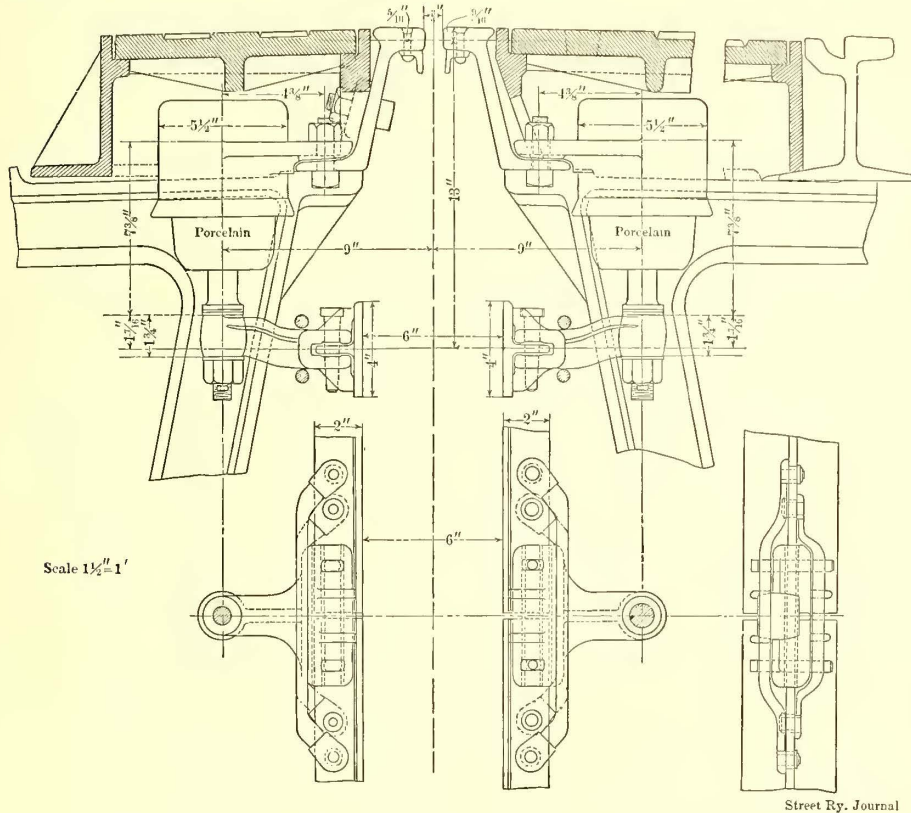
PLAN AND SIDE ELEVATIONS OF INSULATORS IN CONDUIT
